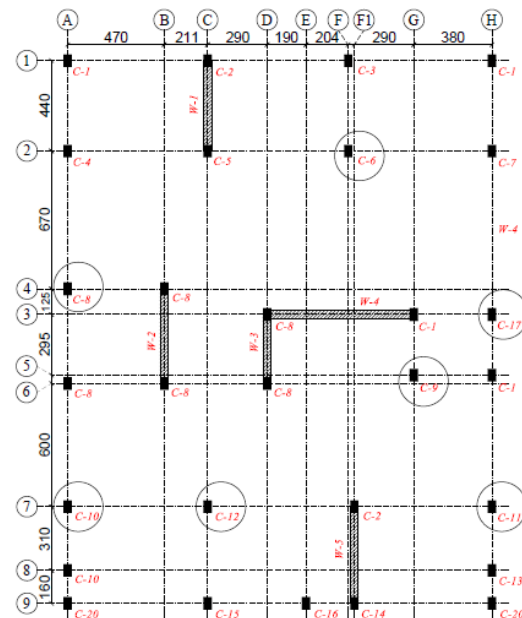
Plan of the building retrofitted by shear walls and steel jacketing
